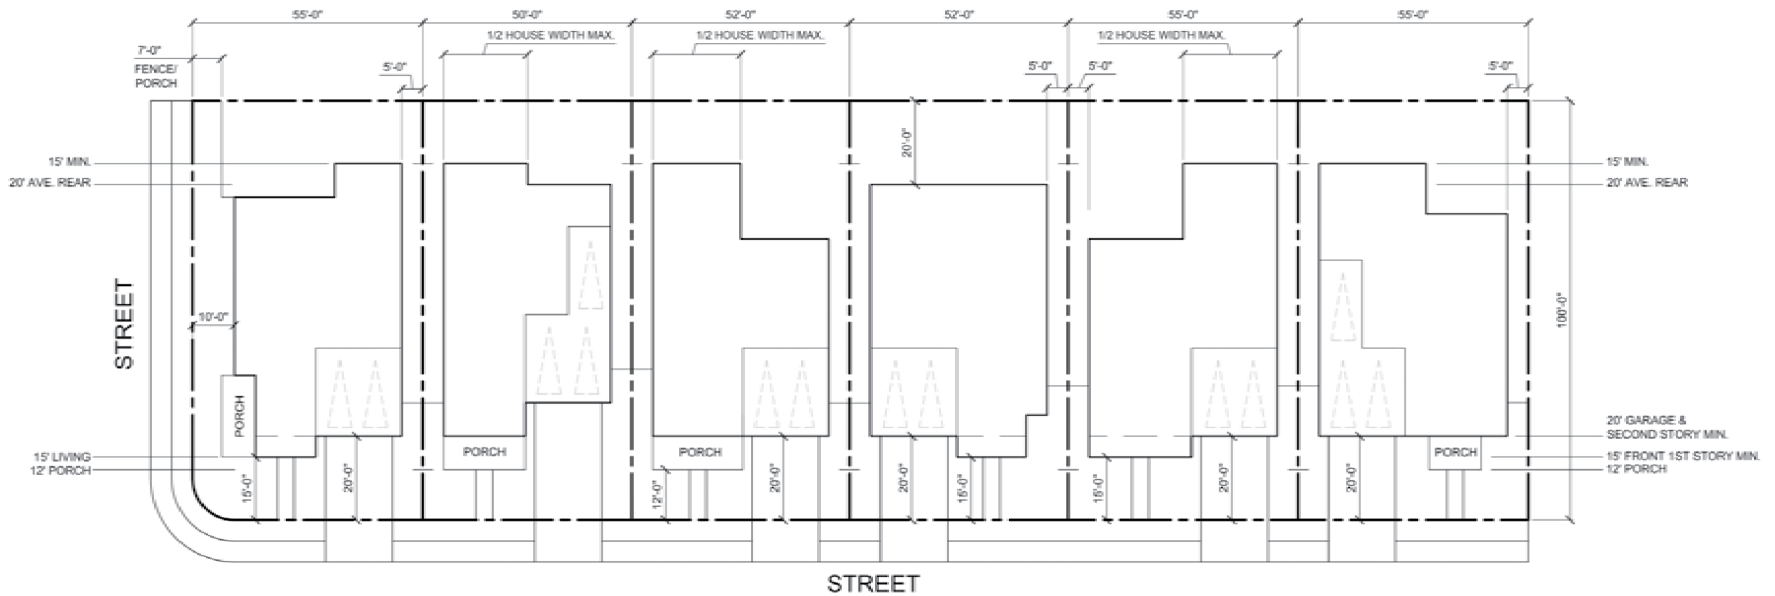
Single Family Detached - Medium Lot Typical Layout
